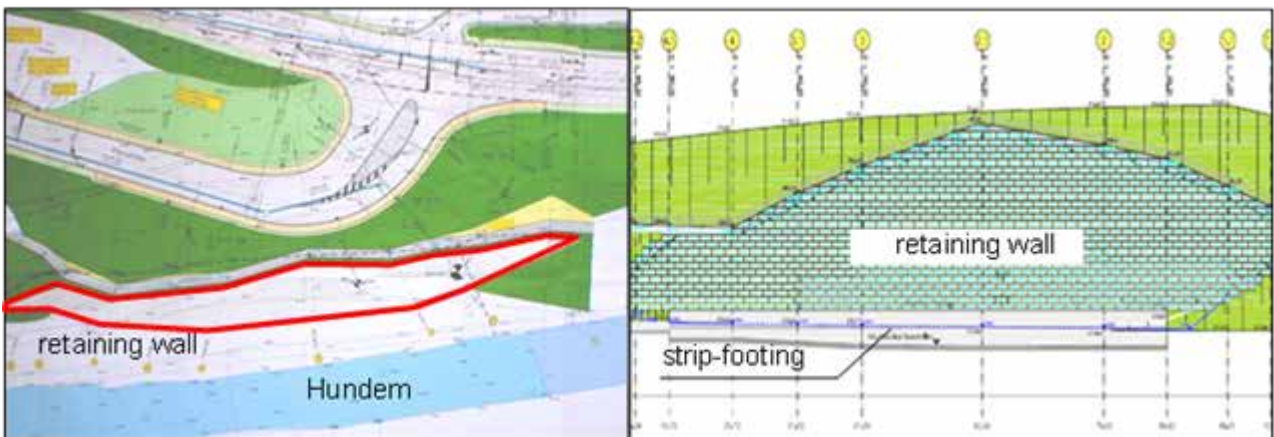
Retaining structure Lennestadt (plan and elevation)
